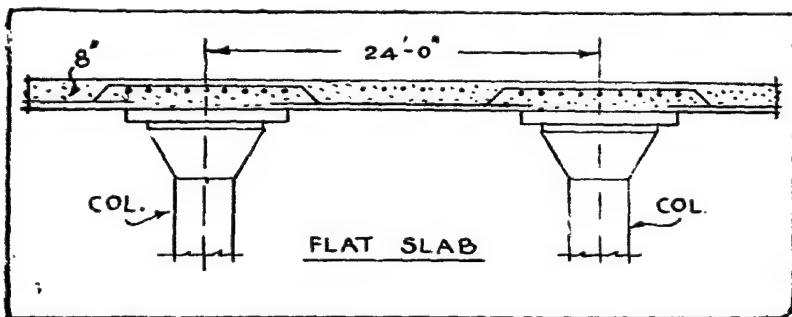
Girder-less or flat-slab R. C. C. Floors.
